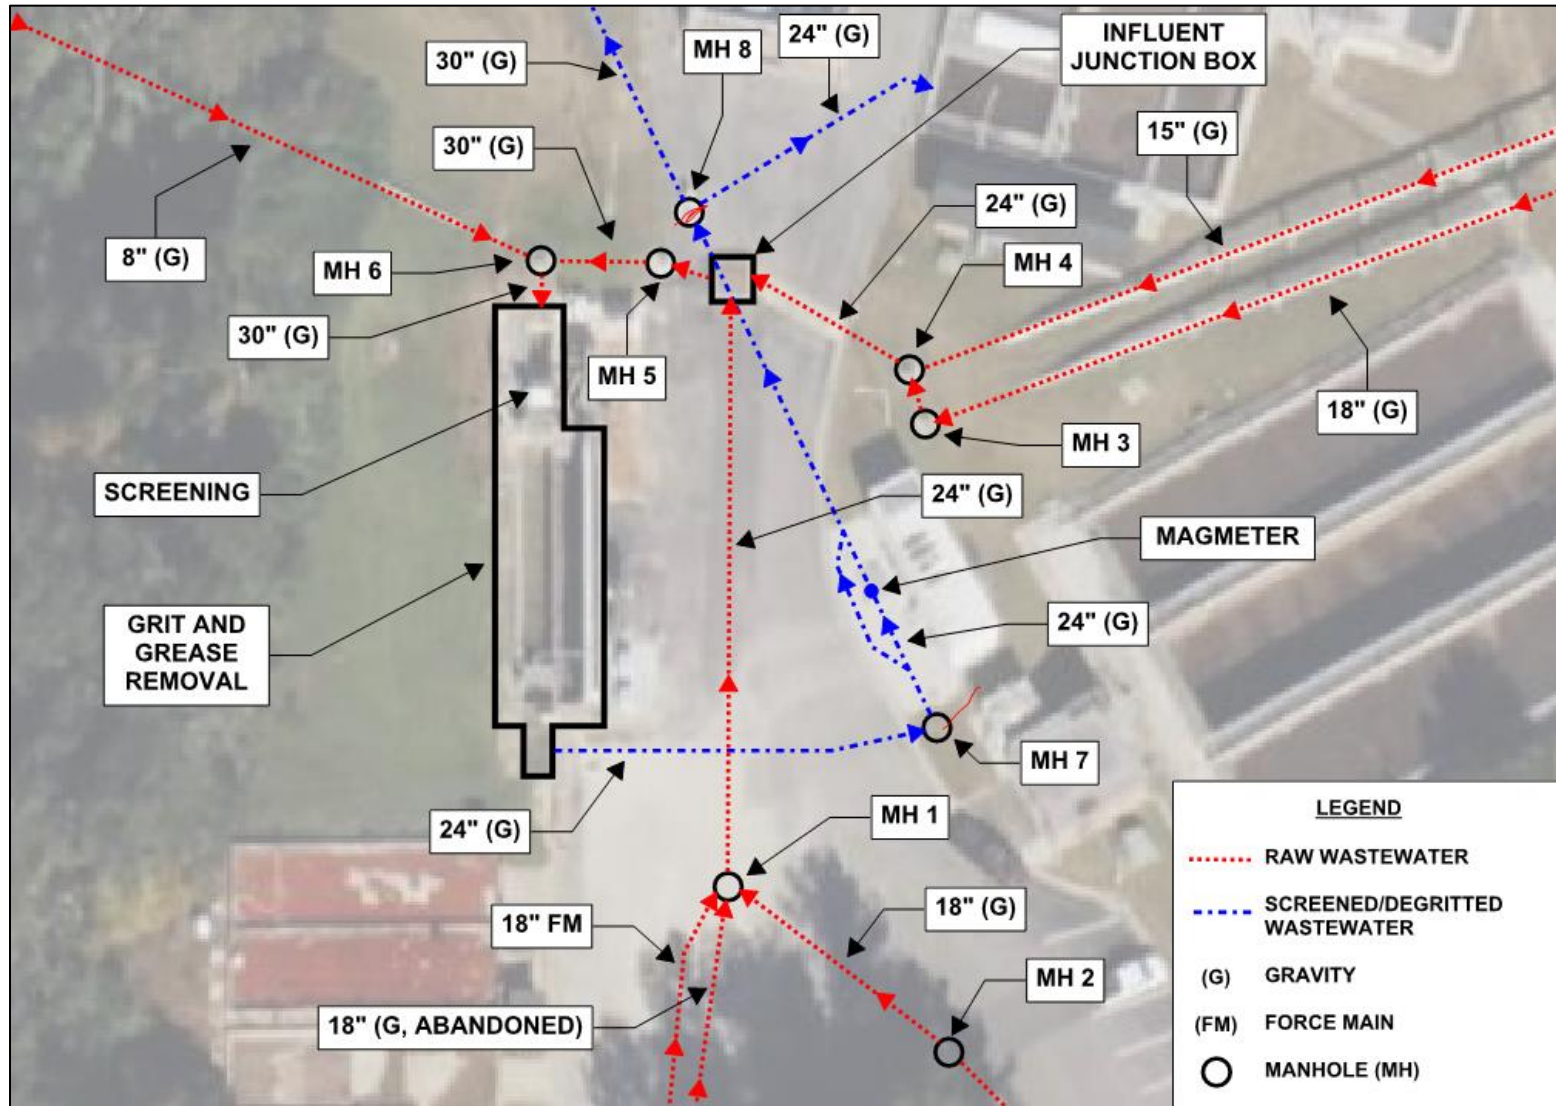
Existing Headworks and Conveyance Piping Layout
